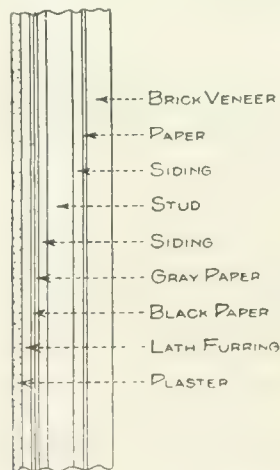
Vertical section through an enclosing wall of a Canadian House.
